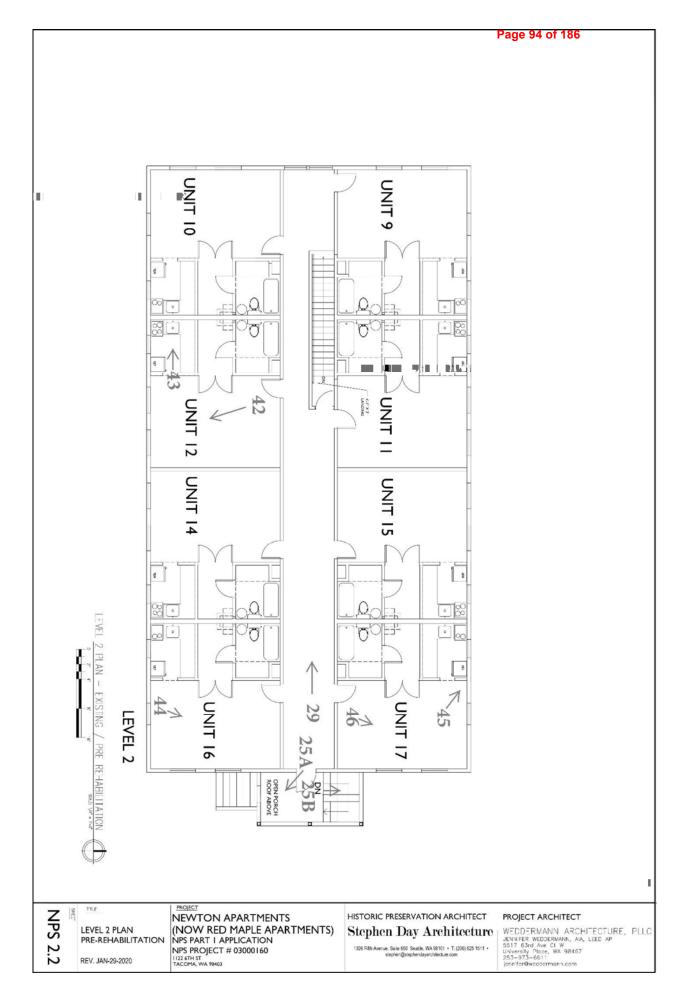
C. Newton Apartments, Level 2 Plan – Pre-Rehabilitation, Photograph Key Plan.
